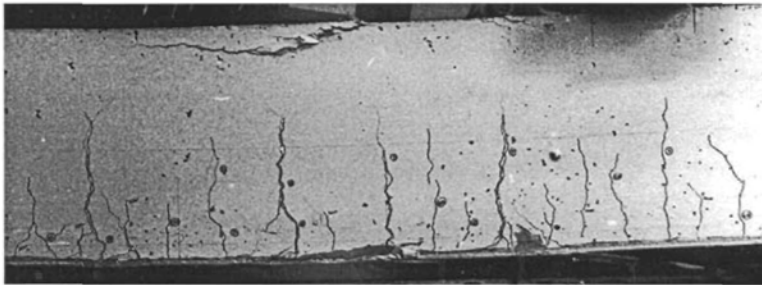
and 1.25 show examples of side and tension face plated beams in which concrete crushing occurred prior to debonding of the plates. Small amounts of IC interface cracking can be seen along the edges of the plates but this was not sufficient to reduce the stresses in the plates so that the beams achieved their theoretical flexural capacities based on the material properties. This may be considered as the desired form of failure as most reinforced concrete beams and slabs are designed to fail due to concrete crushing whether they are under-reinforced or over-reinforced.
